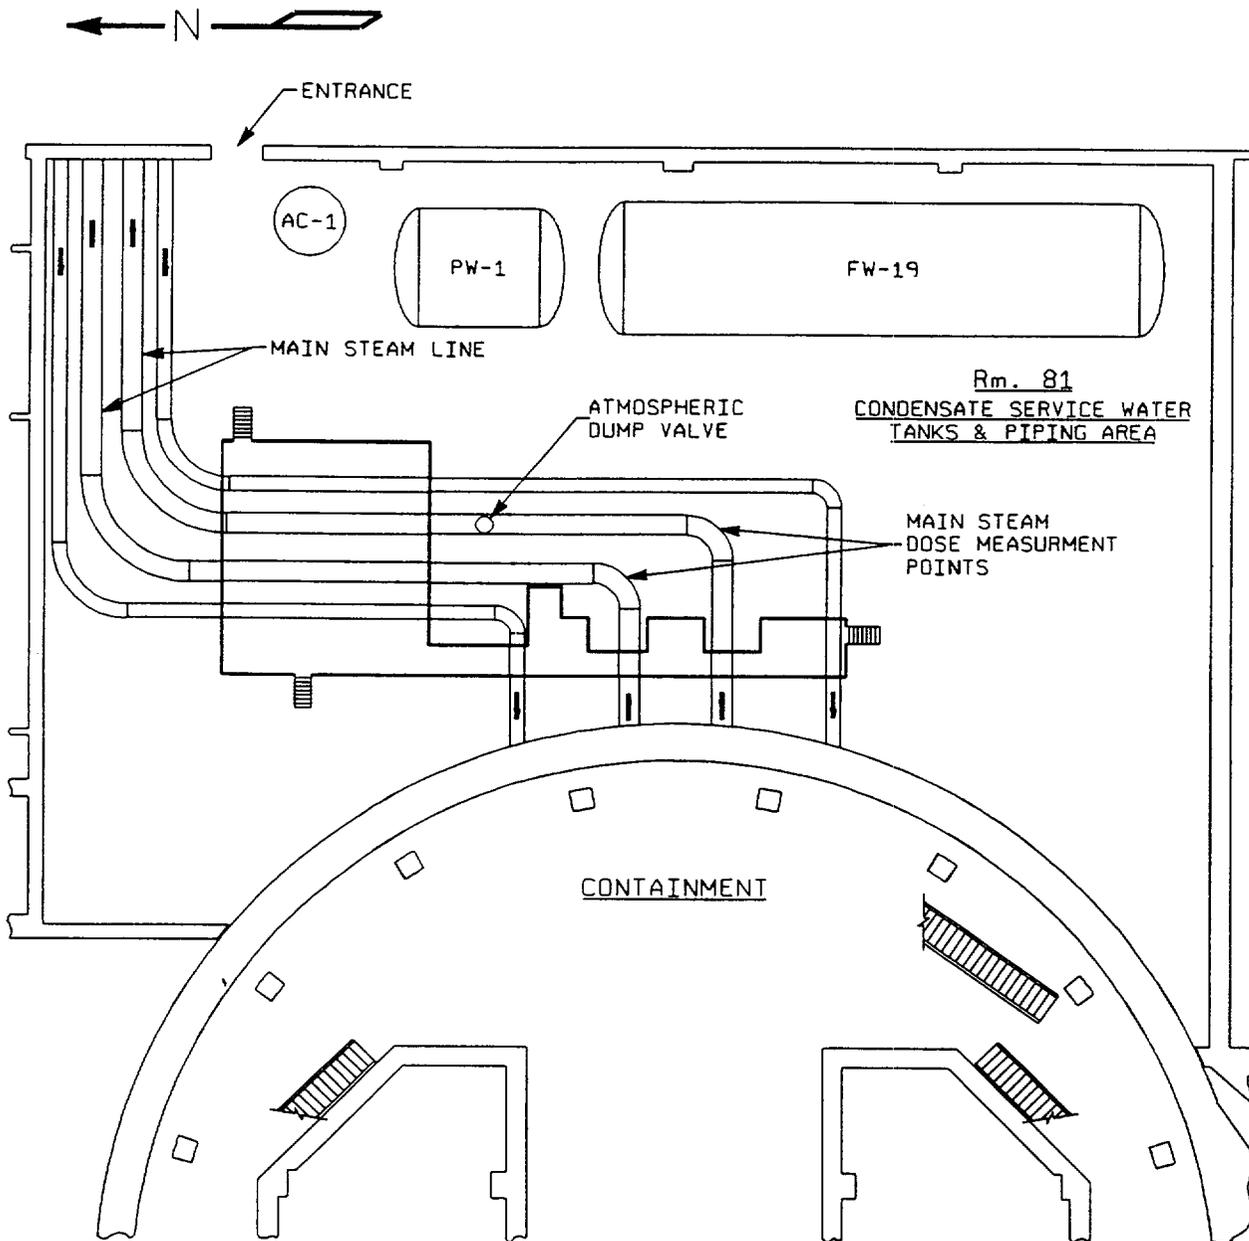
Auxiliary Building - Plant Elevation 1007'-0" & 1013'-0"
